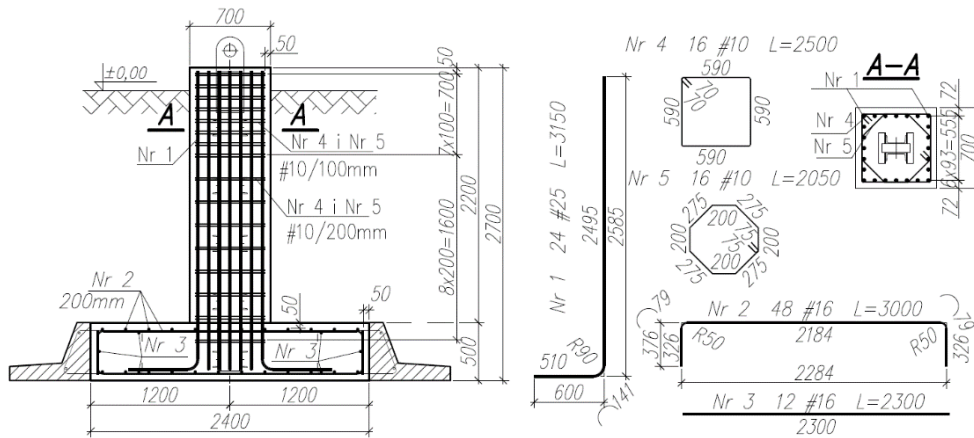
Design details of the foundation to be tested (Enprom Report, 2018)
